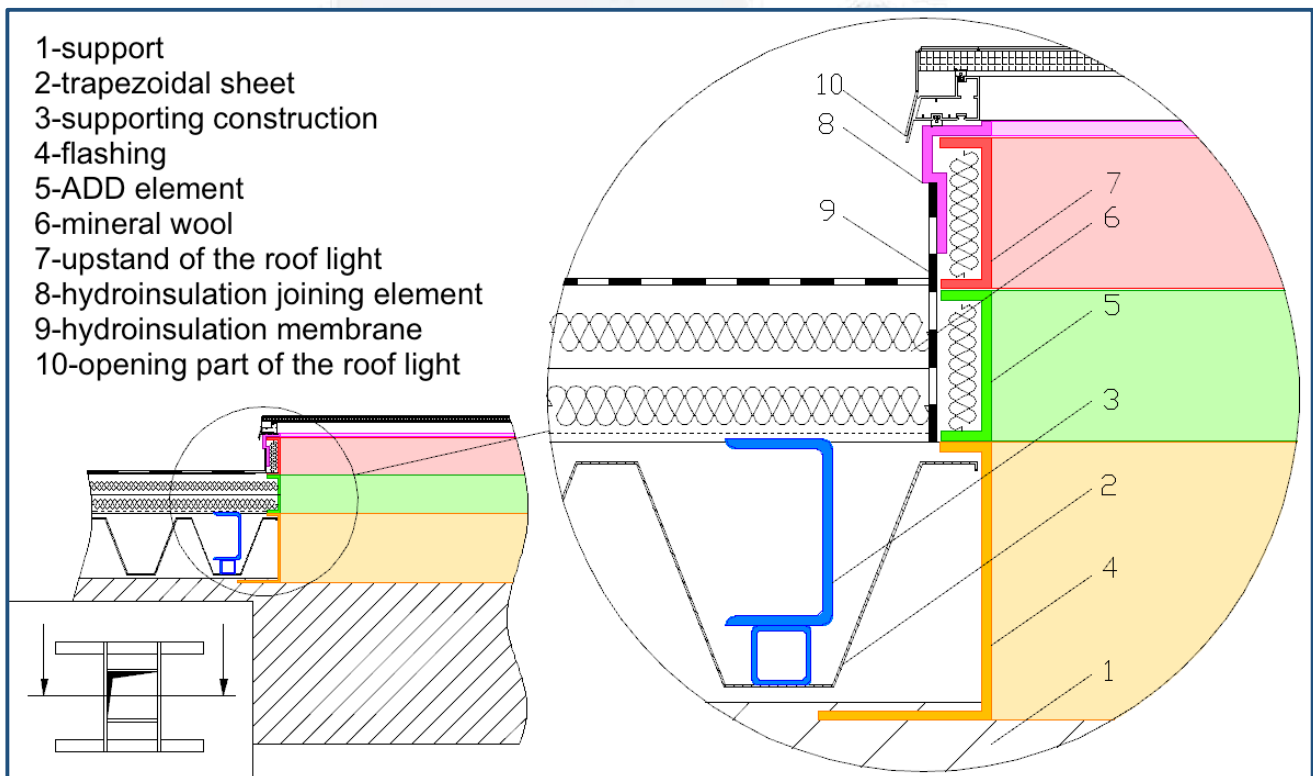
Installation scheme no.4- multilayer roof type
